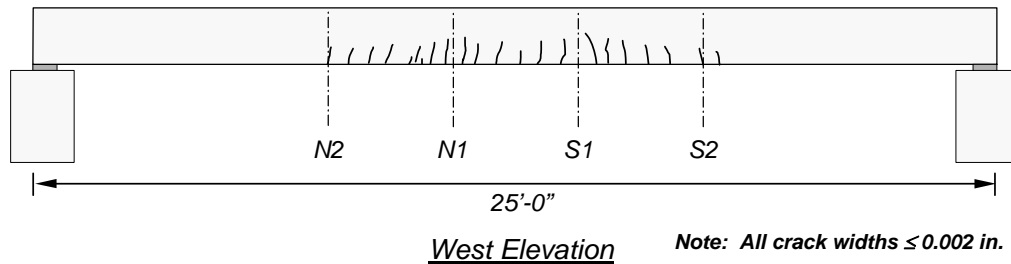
Typical Cracking Distribution after Load Cycles to 7 kip on Specimen FS-1 before CFRP Strengthening
